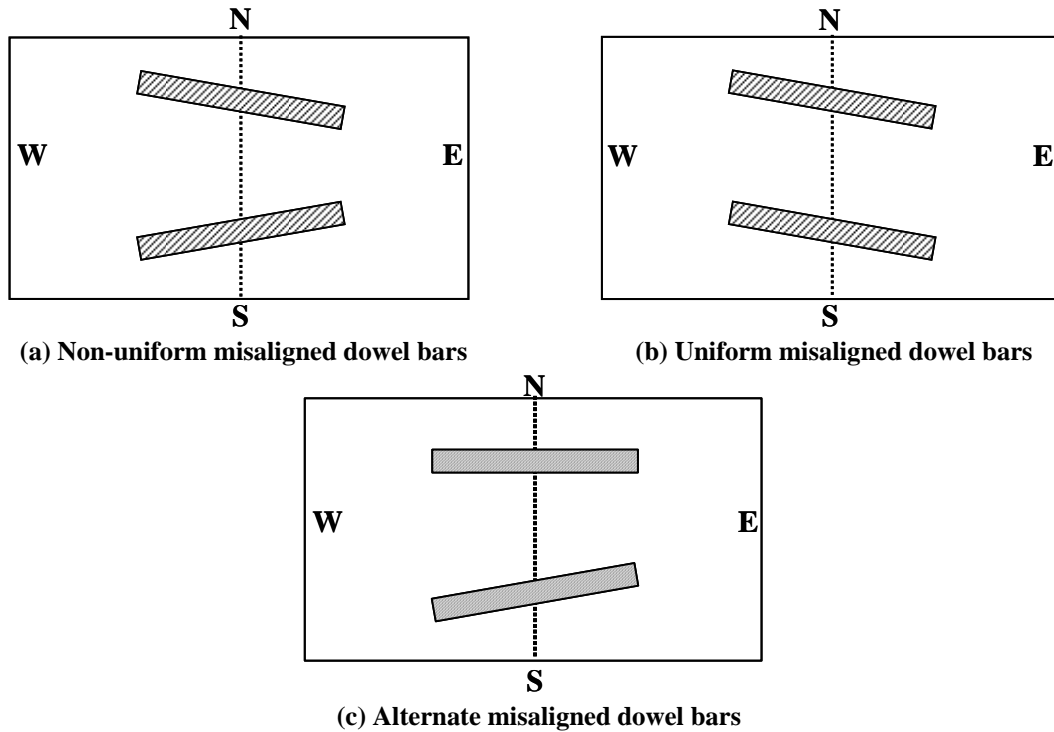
Concrete slab specimen with misaligned dowel bars
